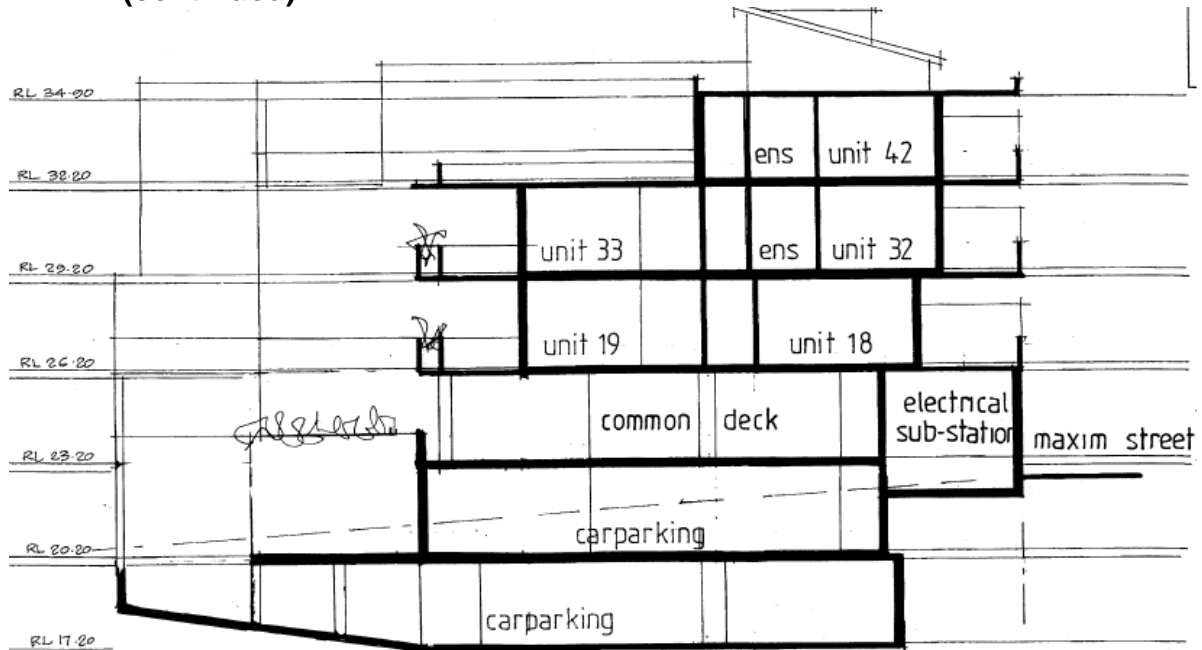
Section plan (Section D-D) along southern boundary (Drawing No. D07, Issue. D)
